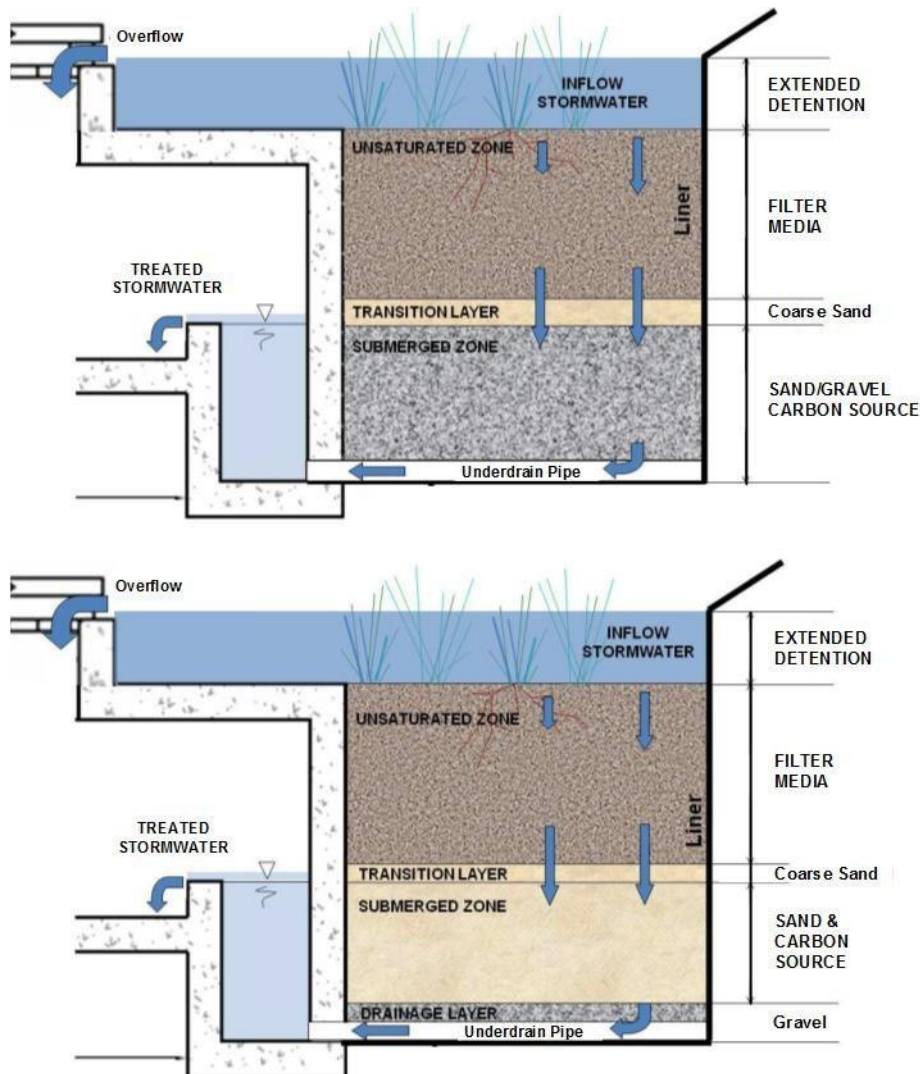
32 Typical bioretention submerged zone (after FAWB, 2009)
